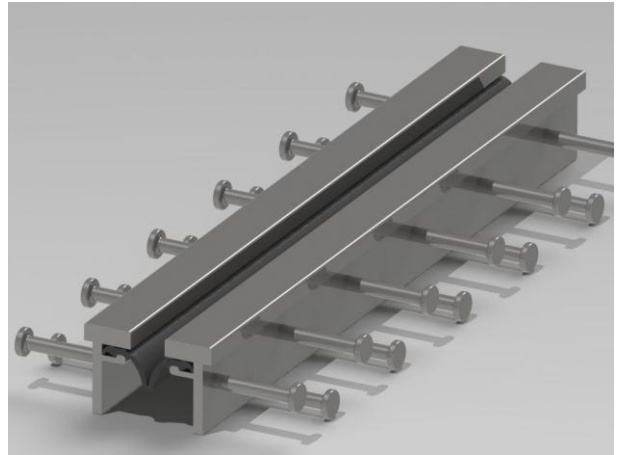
Single gap joint with stud anchorages in normal concrete, for concreted road surface
